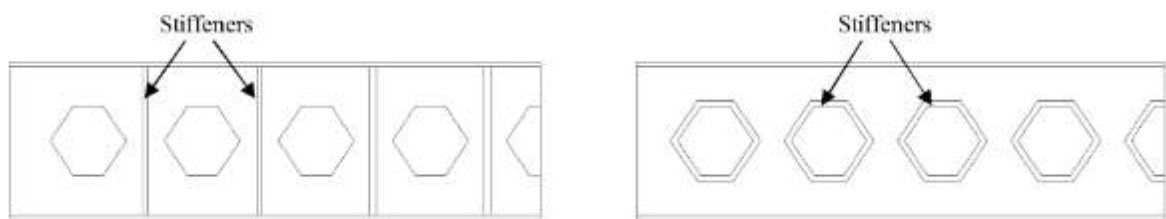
A-Castellated Beam with Stiffeners in The Transverse Direction. B-Castellated Beam Provided with Stiffeners Along Edge of Openings
